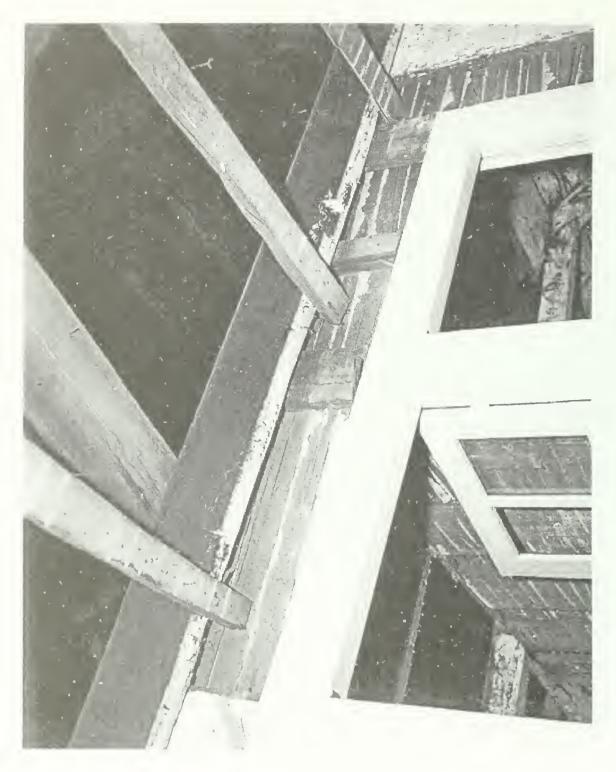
Schuyler House: Second story of kitchen wing after ca.-1815 lath and plaster removed; east wall of hall (Room 206), where mortises in collar beam over ca.-1815 doorways mark location of ca.-1780 doorway (1958).
